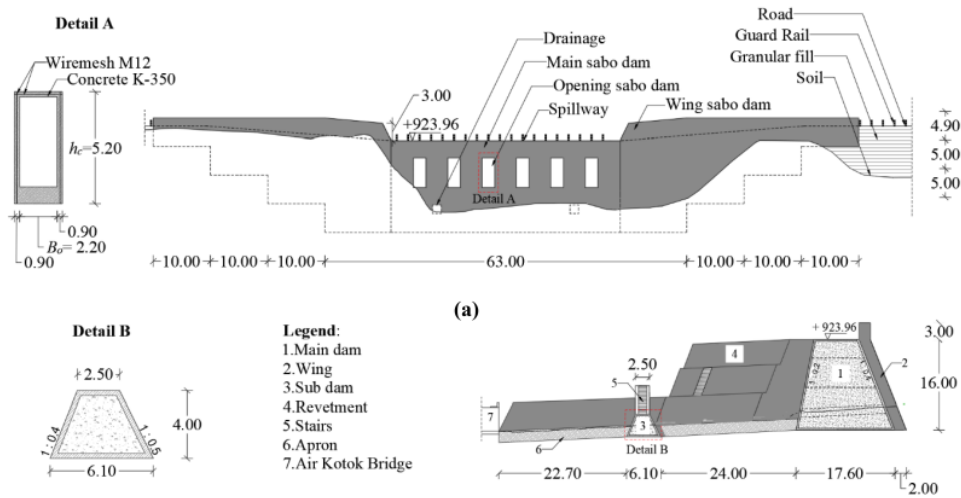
(a) Sabo bridge view from the upstream [Cross-section A-A' in Fig.5]; (b) Sabo dam dimension [Cross-section B-B' in Fig.5]
